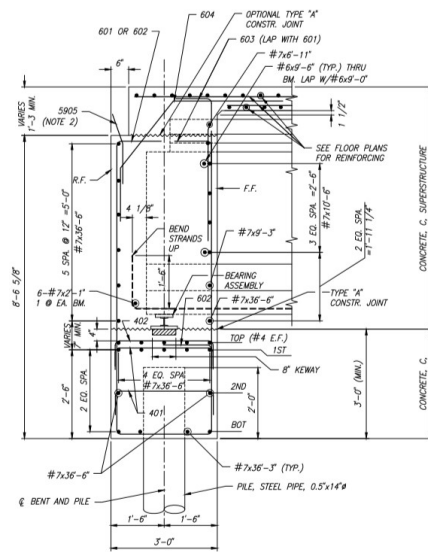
Abutment Detail of Bridge (NBI 5941) (2014)
